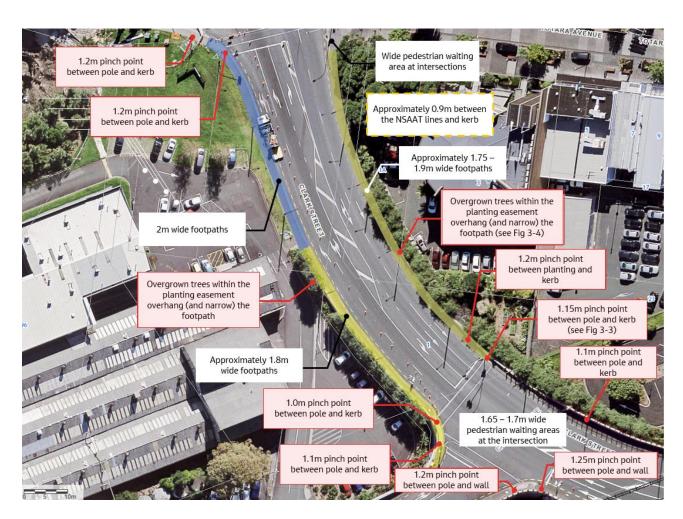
Site visit observations and footpath widths for Clark Street north of Cambridge Lane
